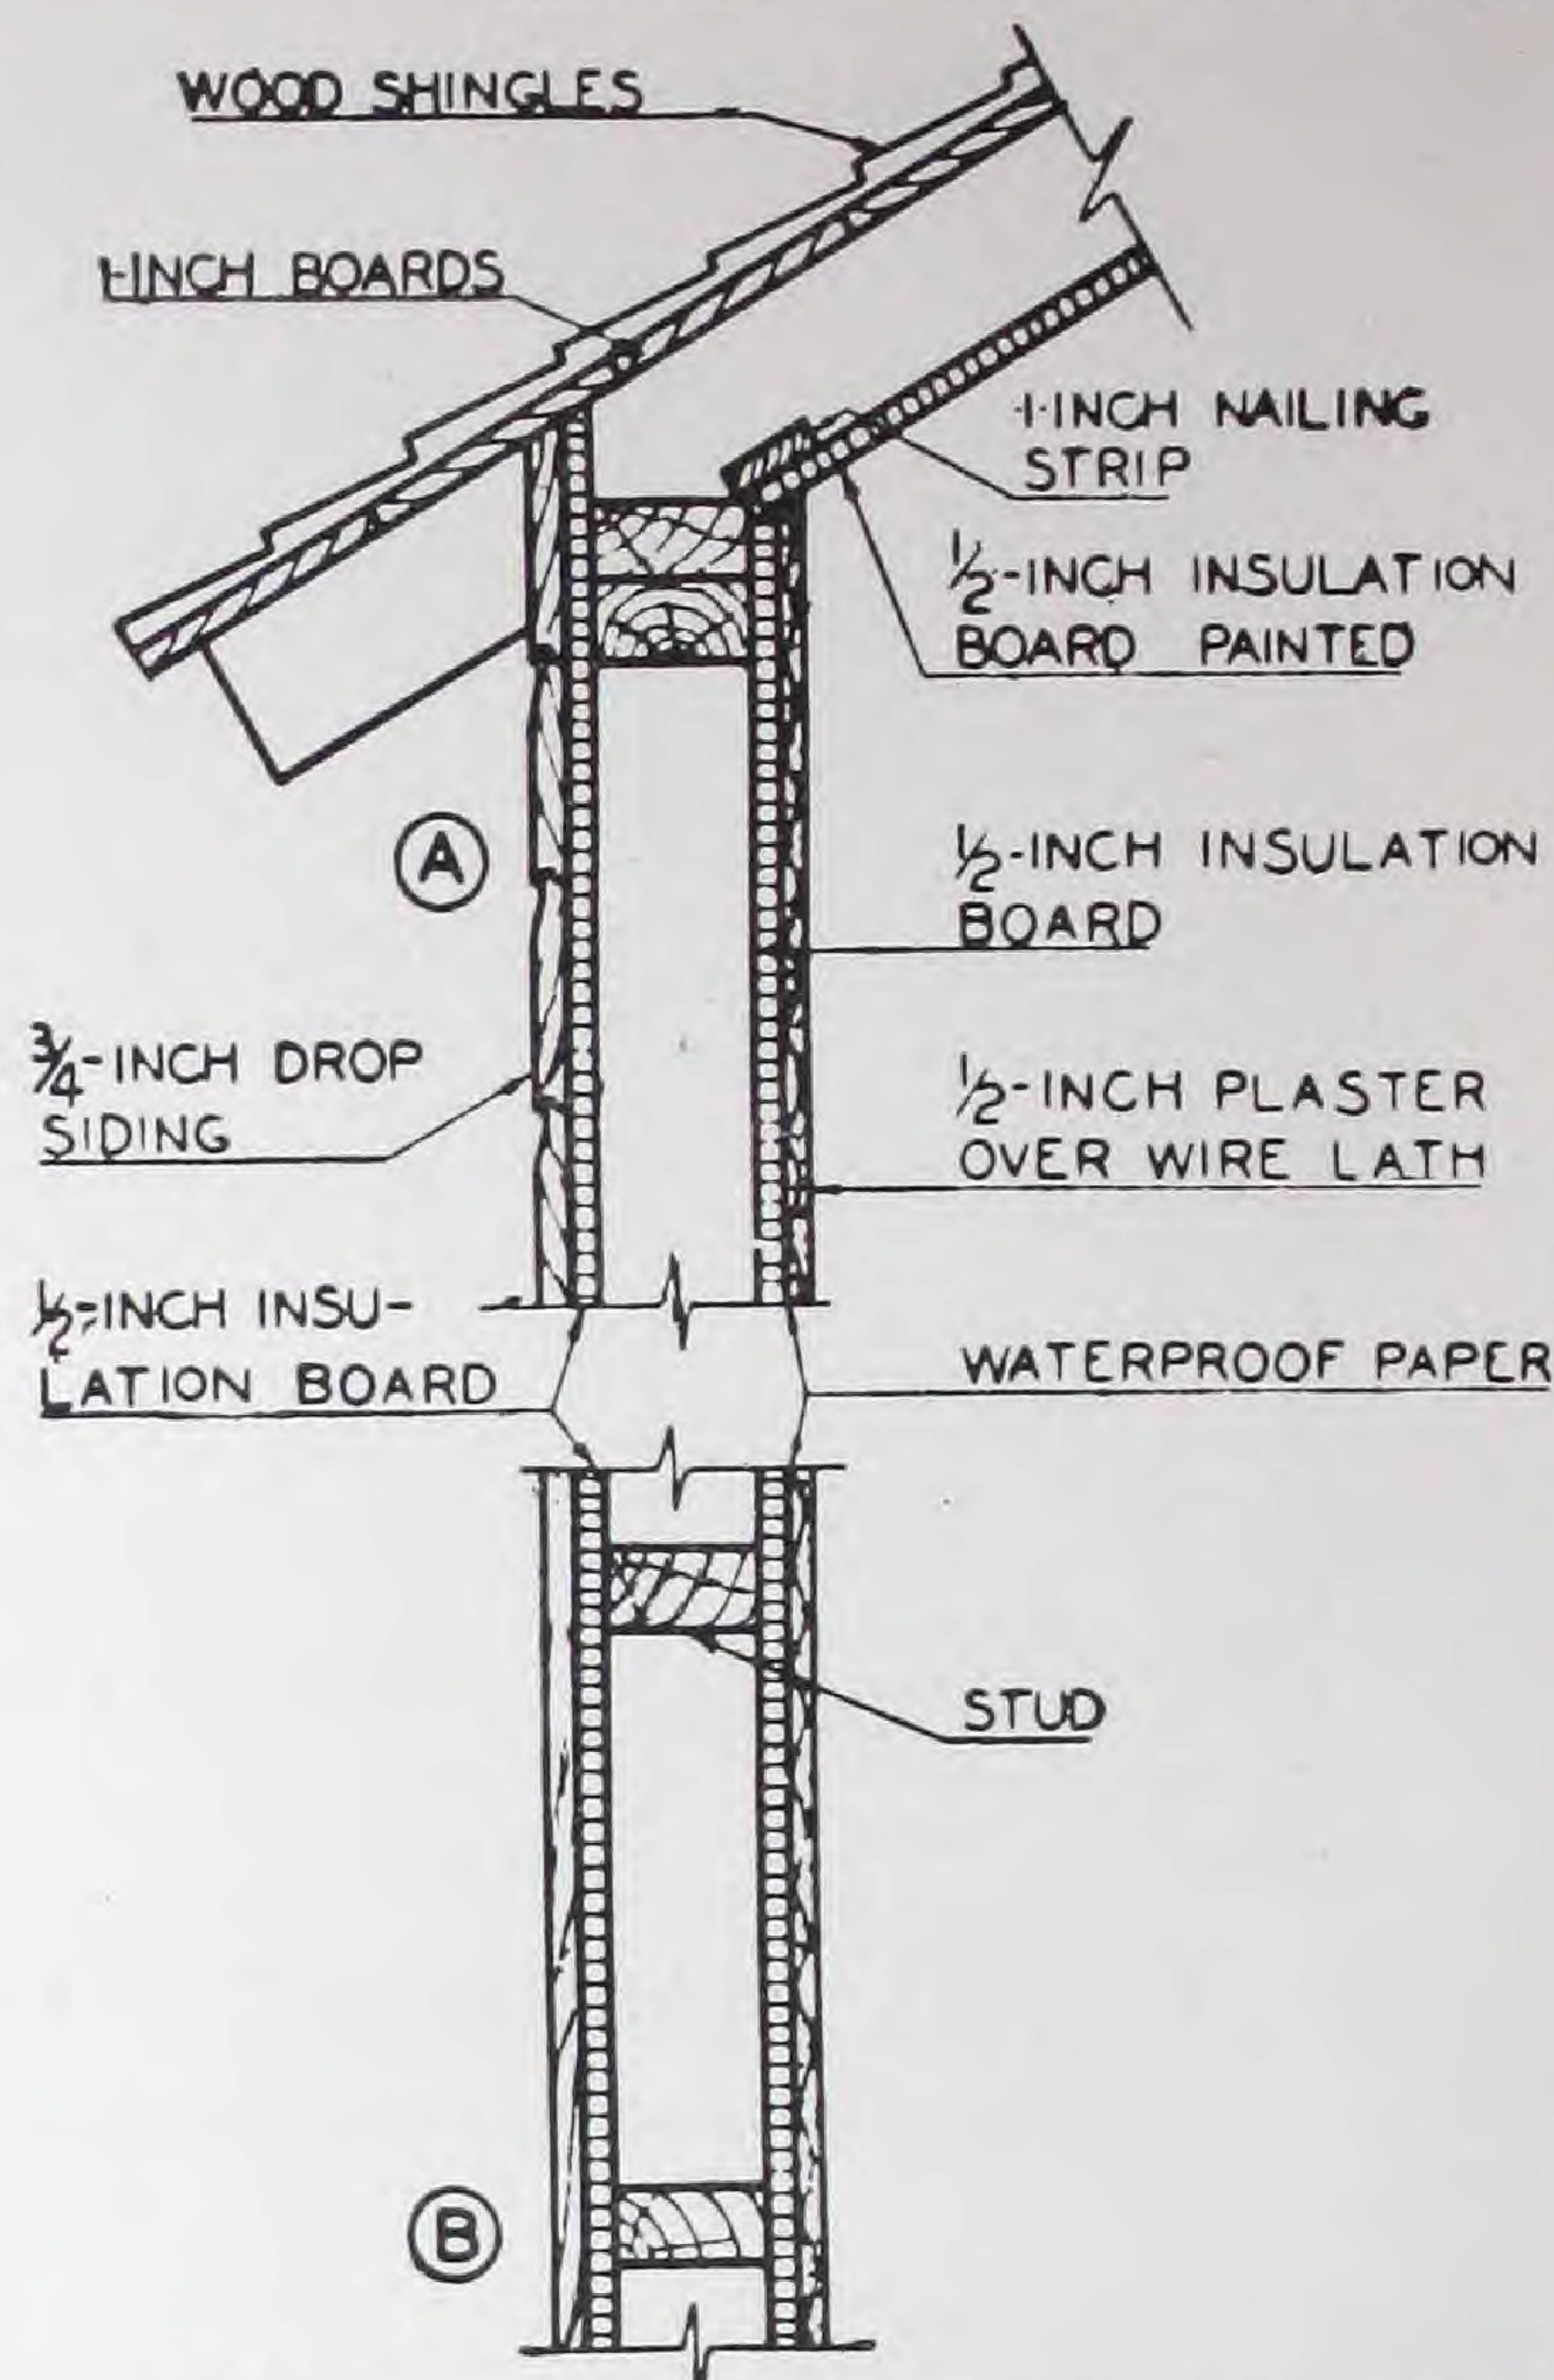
Insulated frame hog-house construction. A is a vertical section through wall and roof; B is a horizontal section through wall.
